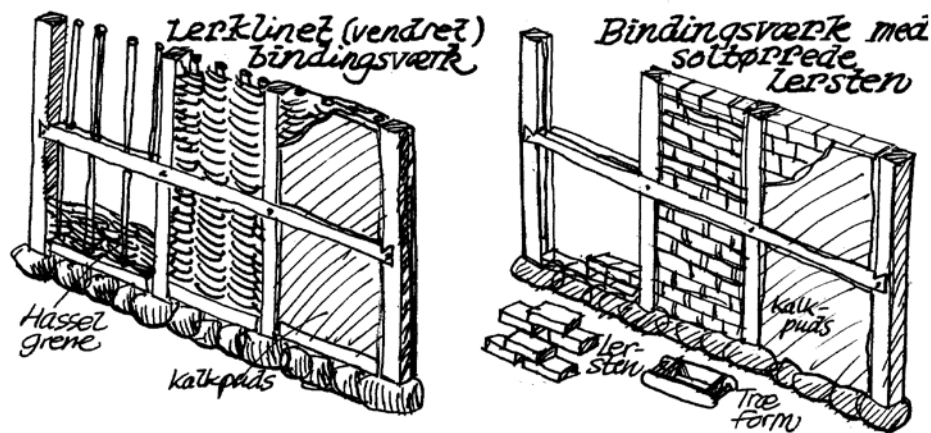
The two unburnt clay constructions in Danish timber frame buildings: Wattle and daub (left) and adobe (right). Drawing: Søren Vadstrup.
